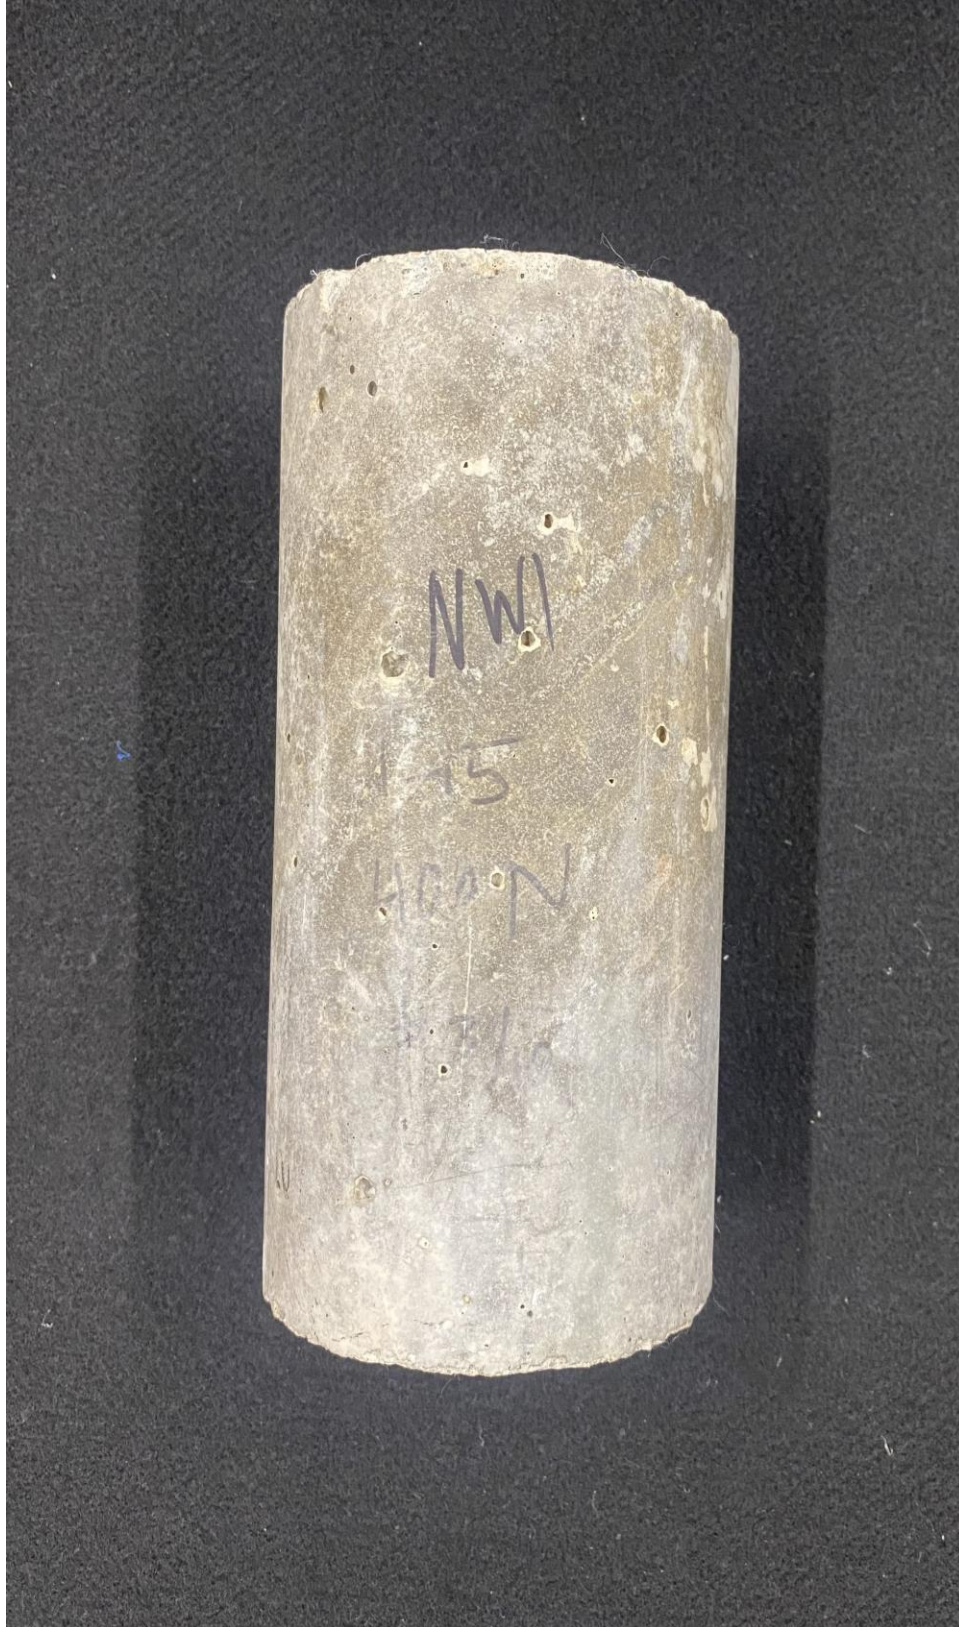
Cylinder 1 of normal-weight concrete deck at bridge F-818 (after testing).
